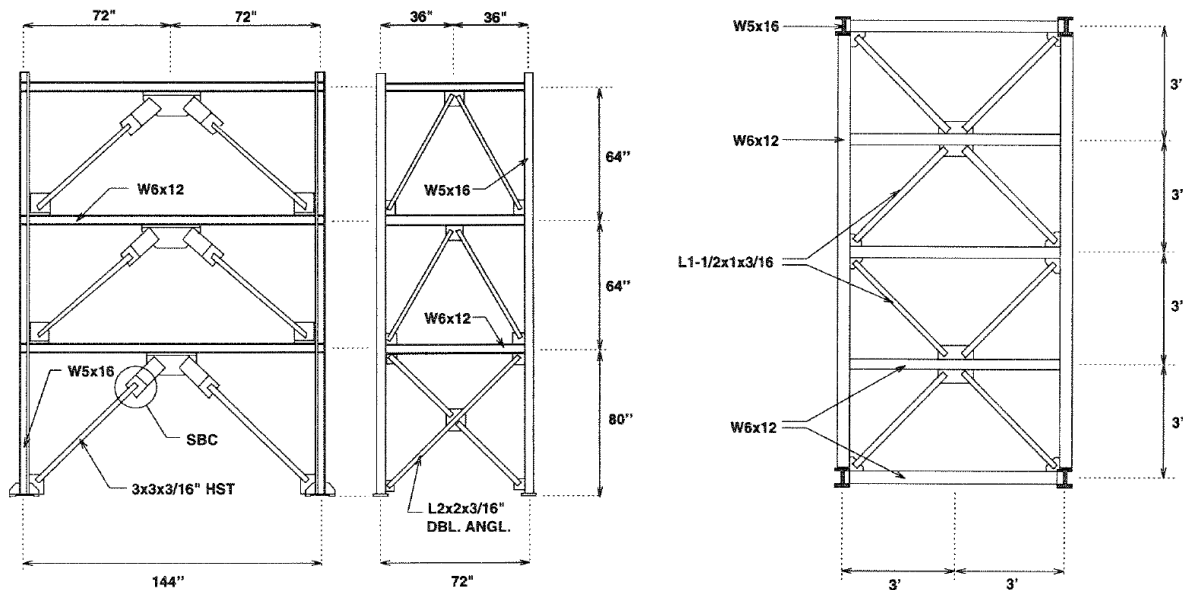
Schematic description of specimen showing elevations (left) and typical framing plan (right), reproduced from Grigorian and Popov [1992]
